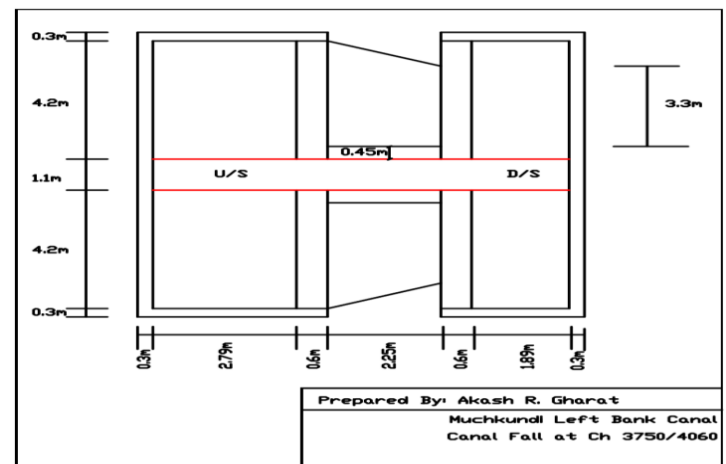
Plan of Canal Fall at Ch.3750/4060
